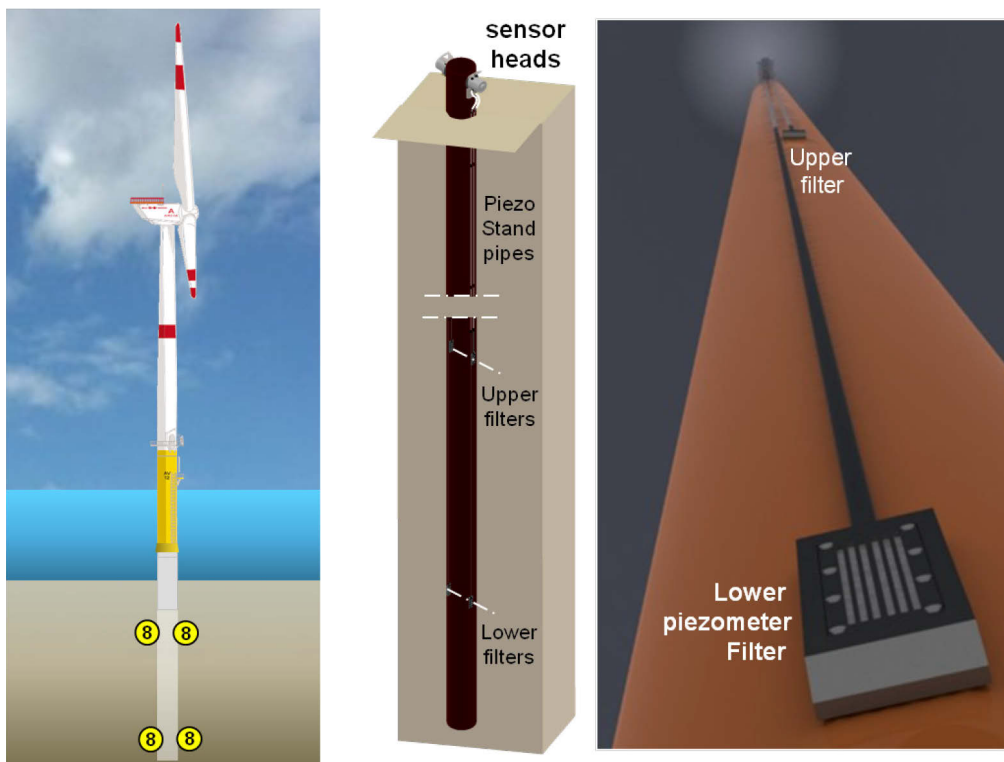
Pile piezometers (8) at two elevations along a monopile and outlines of the NGI pile piezometer system with external standpipes and filter boxes
